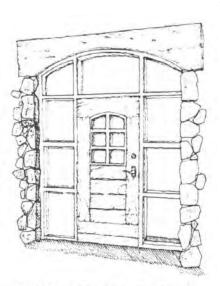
Entry doors at retail shops should express detail and craftsmanship.
